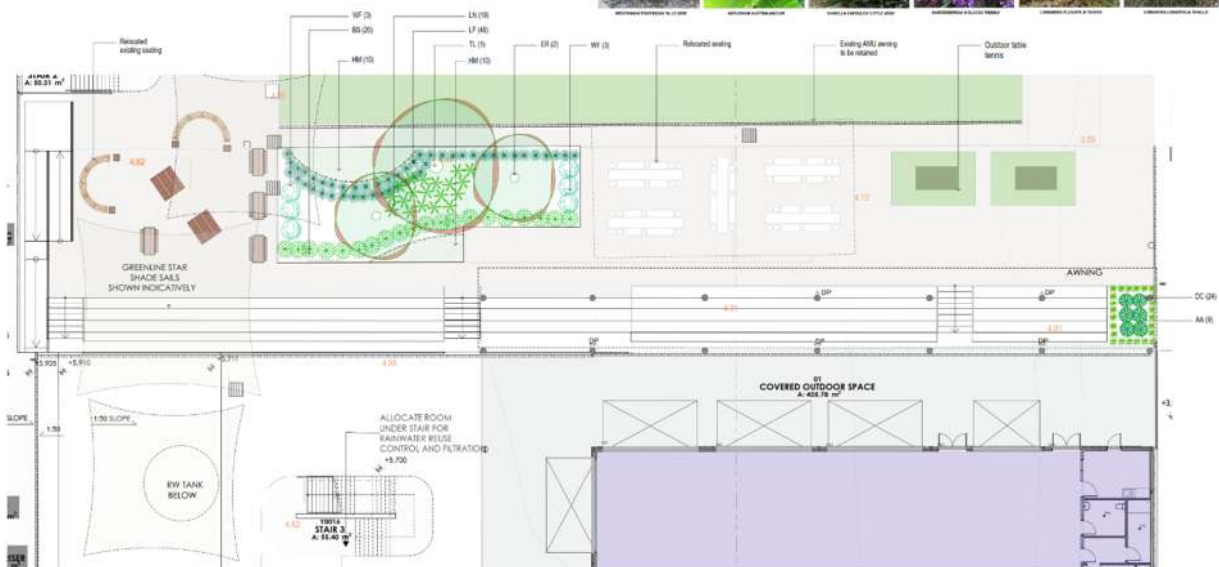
Landscape Schematic Planting Plan, Outdoor Covered Area. Source: Space Landscape Design, 2023.
